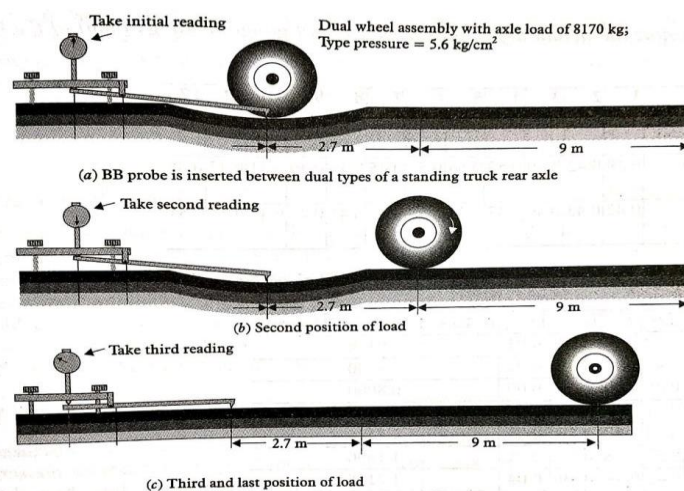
Measurement of pavement surface rebound deflection using Benkelman Beam
